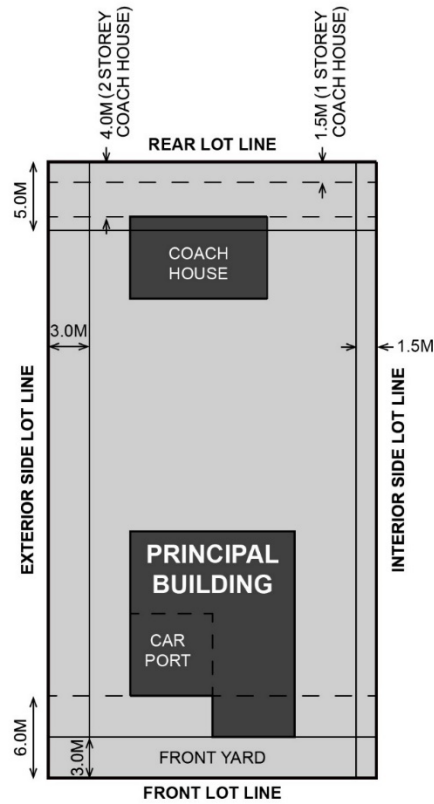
R1.2 Principal Building and SSMFH Coach House Setbacks.
